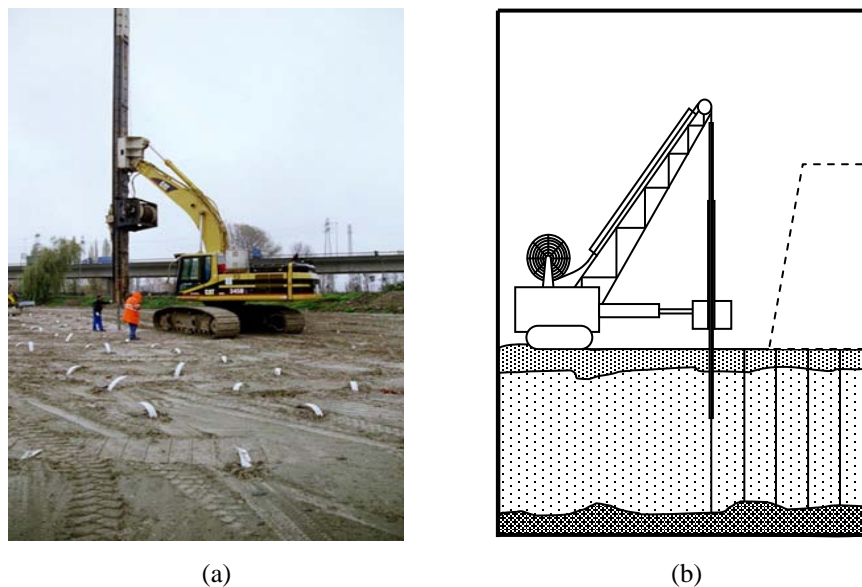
The installation of prefabricated vertical drains: (a) In site photograph, (b) Schematic drawing
